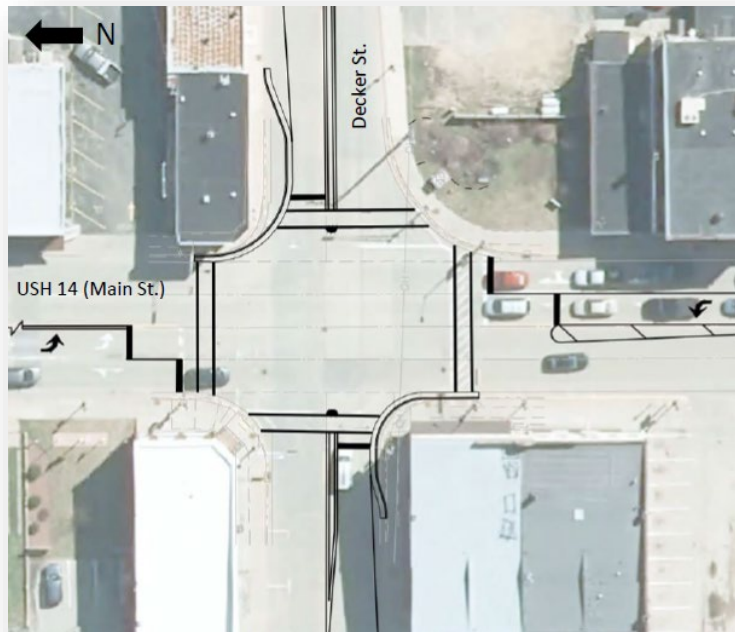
An aerial drawing illustrating planned bump outs at the intersection of Main Street with Decker Street.
